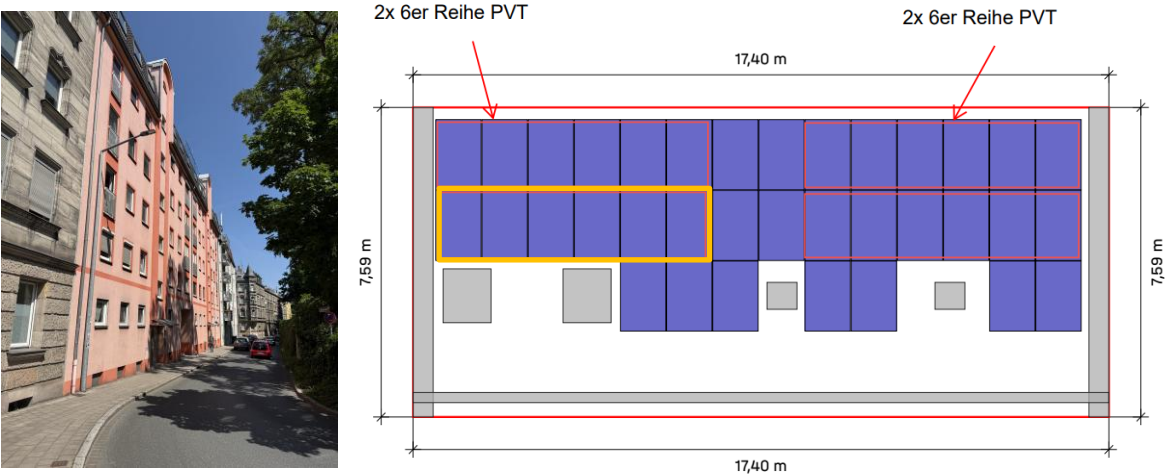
Sketch of the PVT system (right picture) installed on the west roof of the building (left picture)
